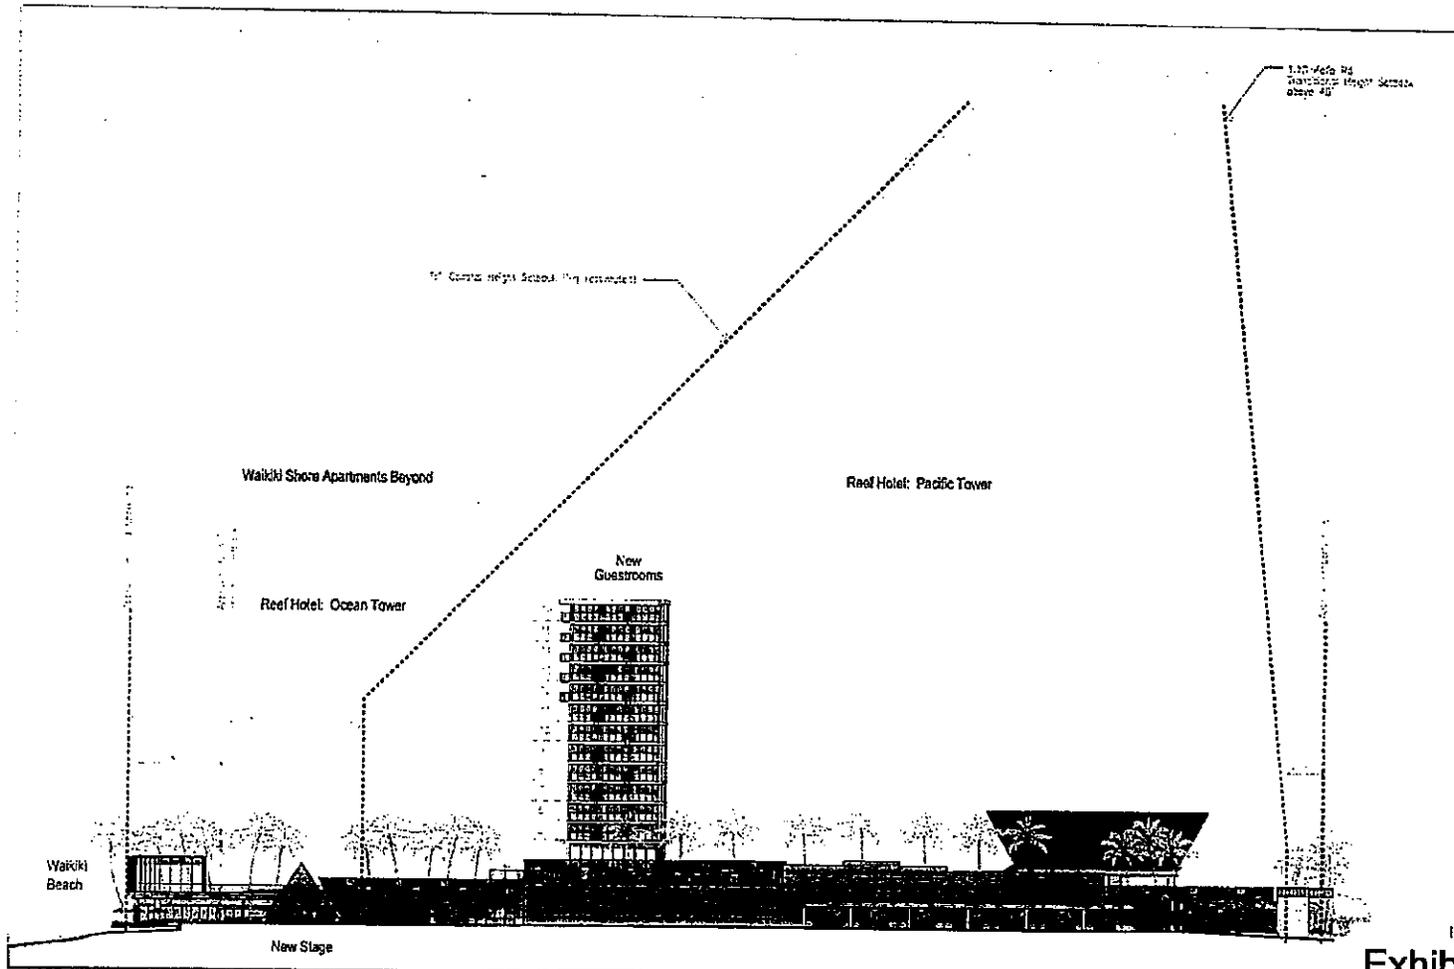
Site Elevation 4 (Diamond Head Looking 'Ewa)
